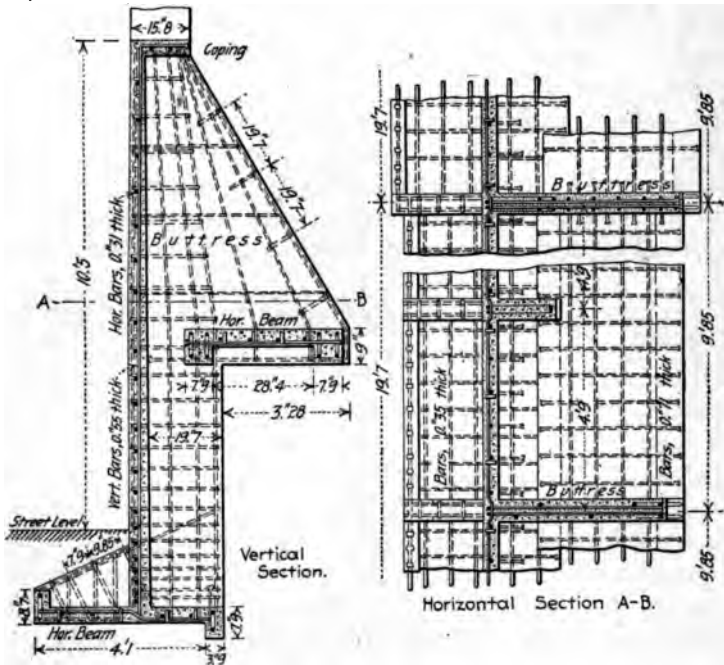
Retaining Wall for Sunken Street, Paris, France.
